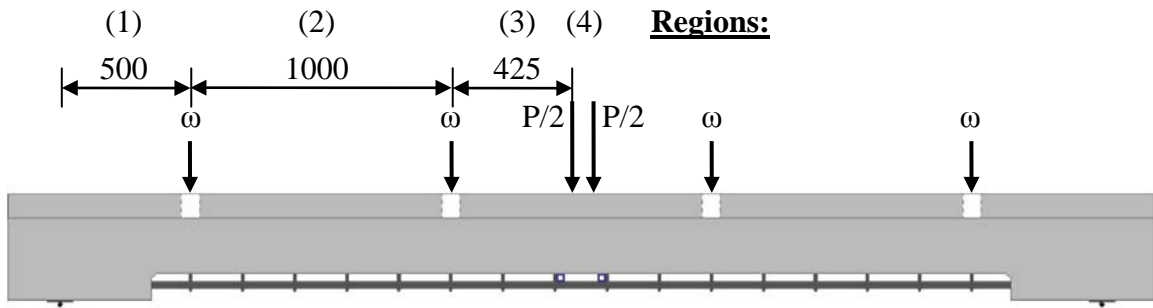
Loading Configuration for Specimen 1 (All Dimension in mm).
